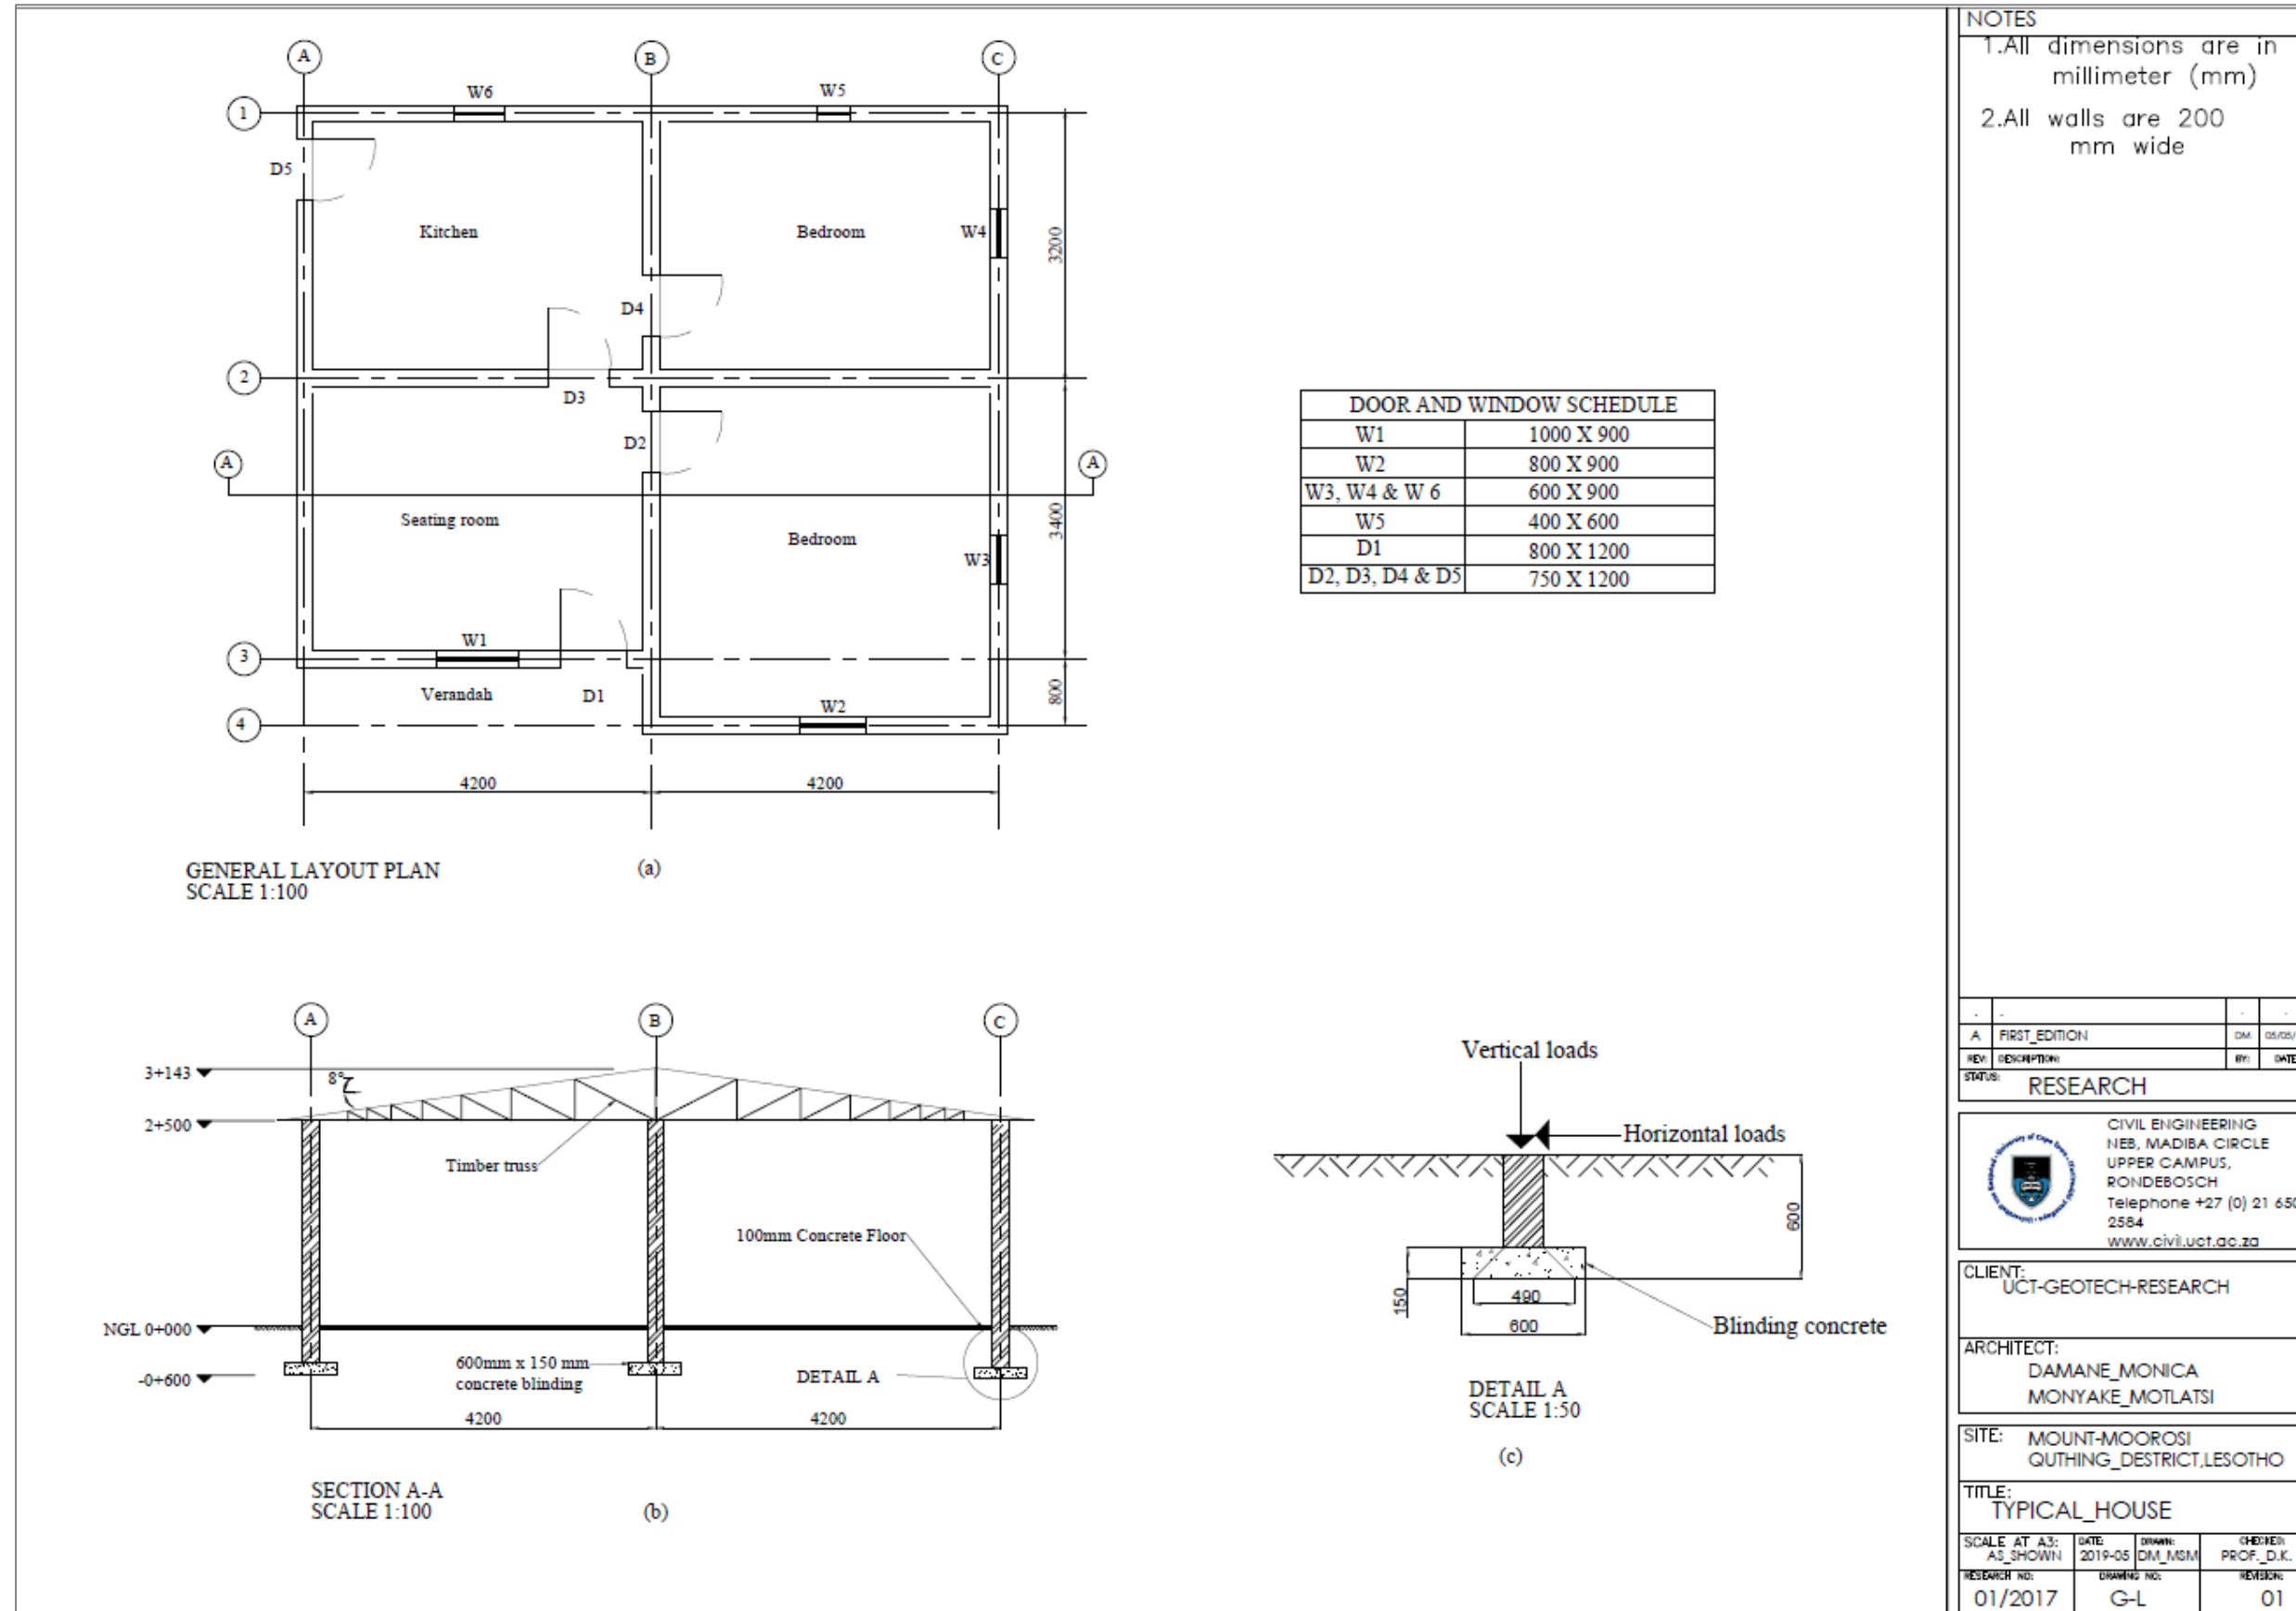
, Plan and sectional view of a typical house in Mount Moorosi village
